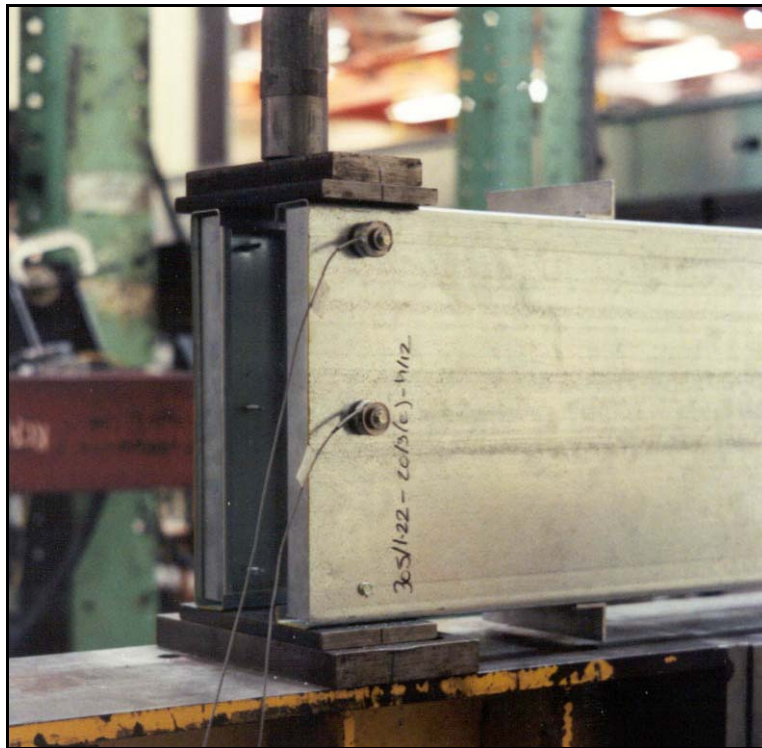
Photograph of a Pair of C-Sections with Bearing Stiffeners During Testing
